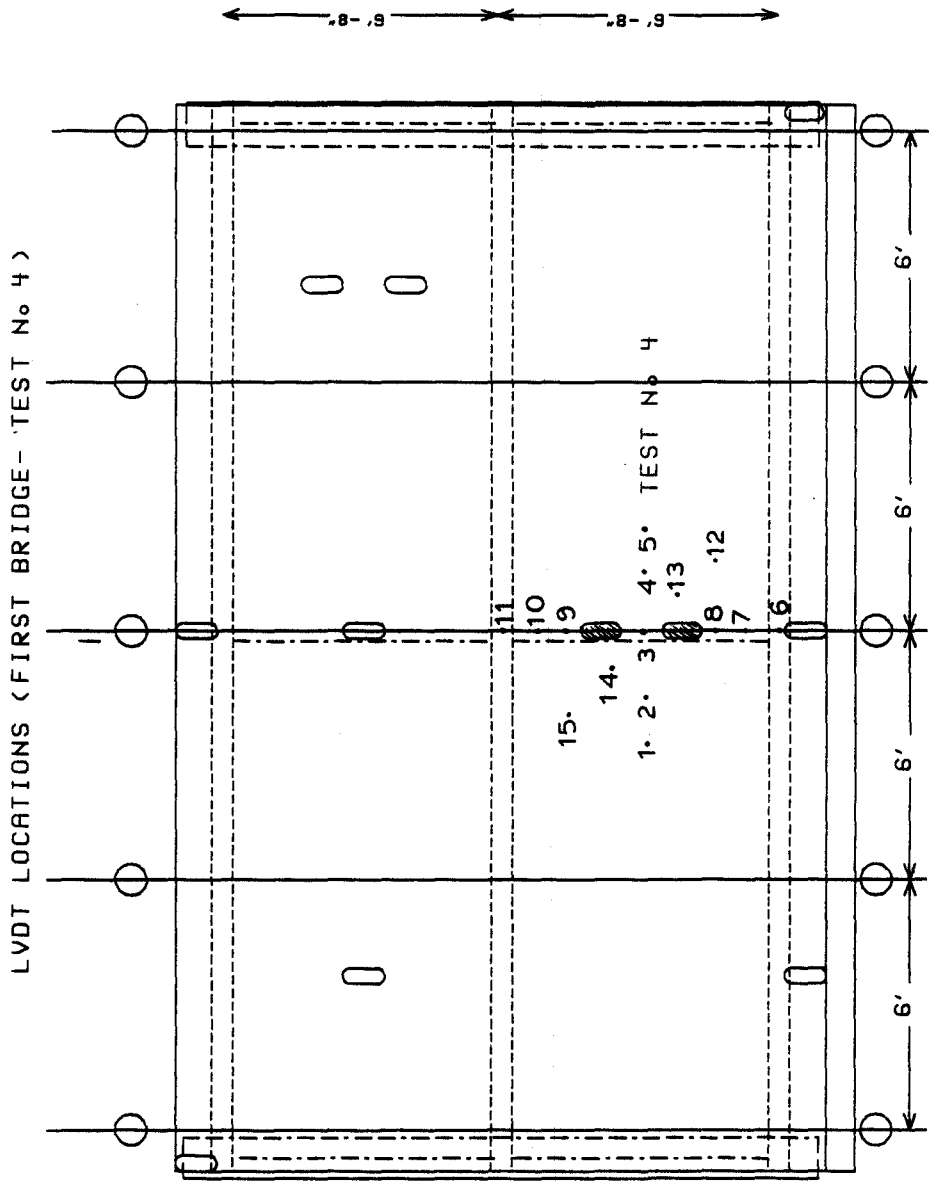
LVDT Locations (First Bridge - Test No. 4)
